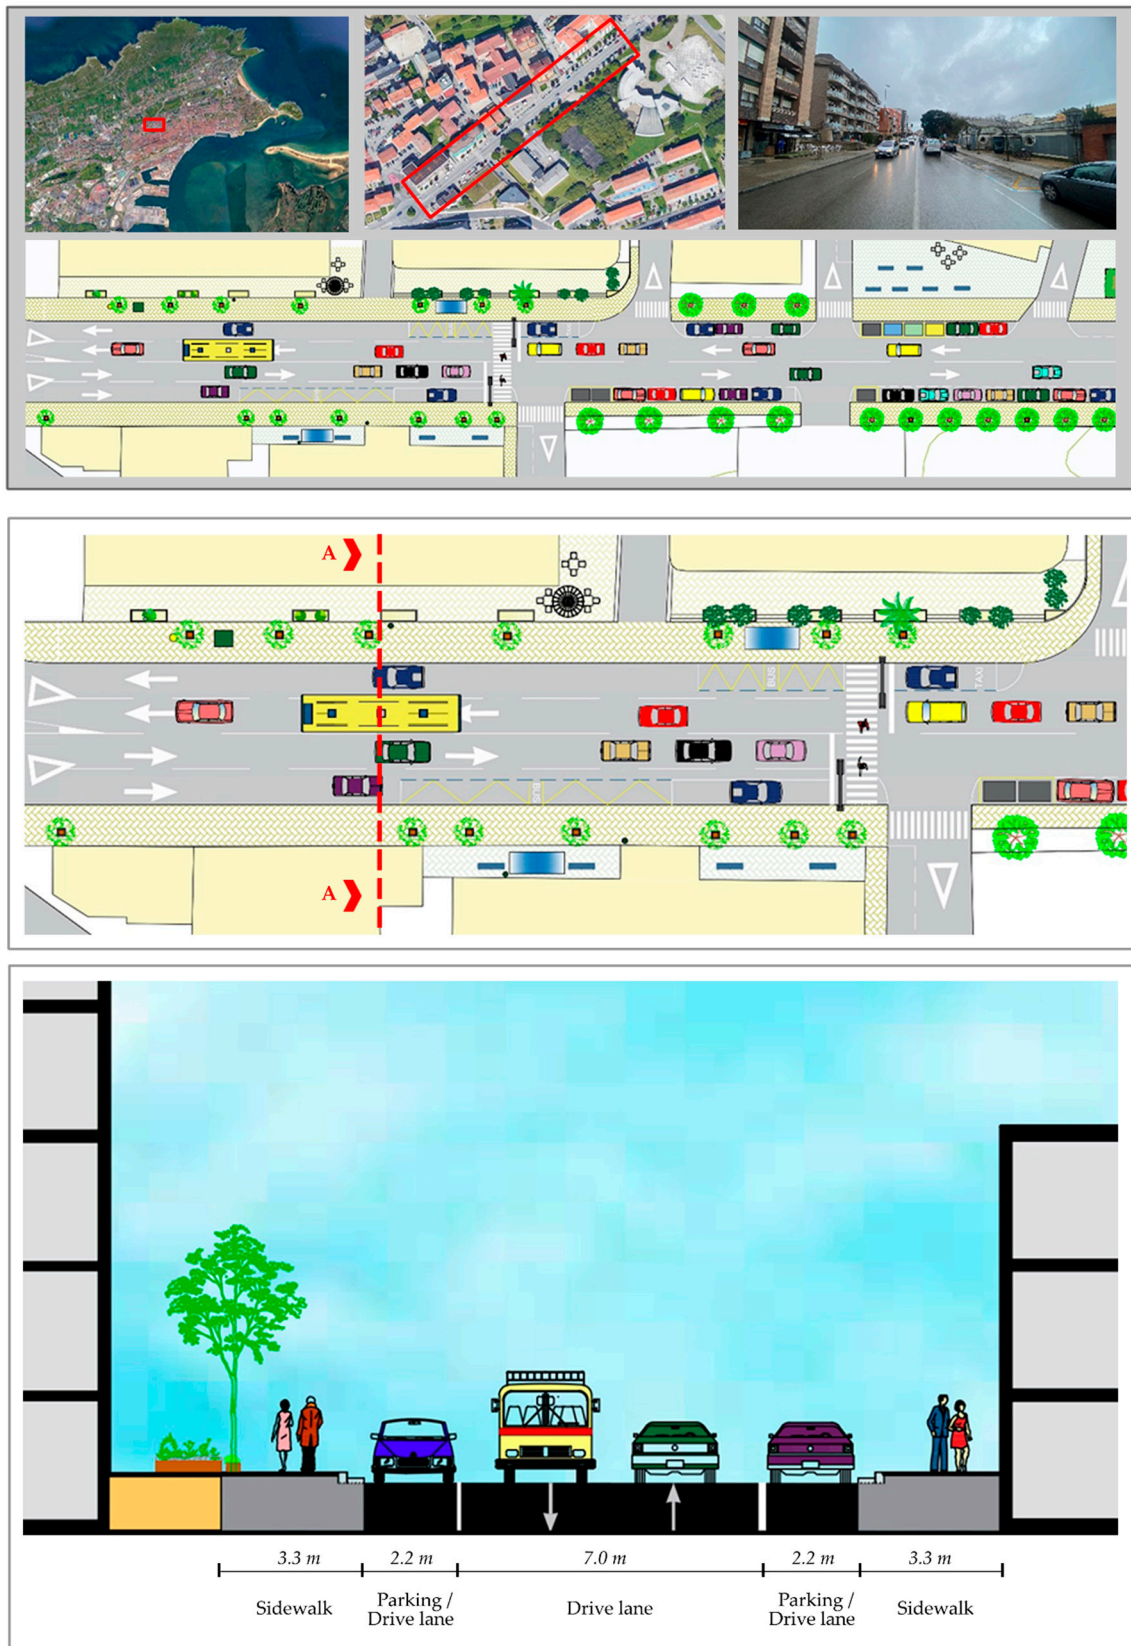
Current situation of Paseo del General Dávila, Santander (Spain). Plan view and cross-section A-A.
